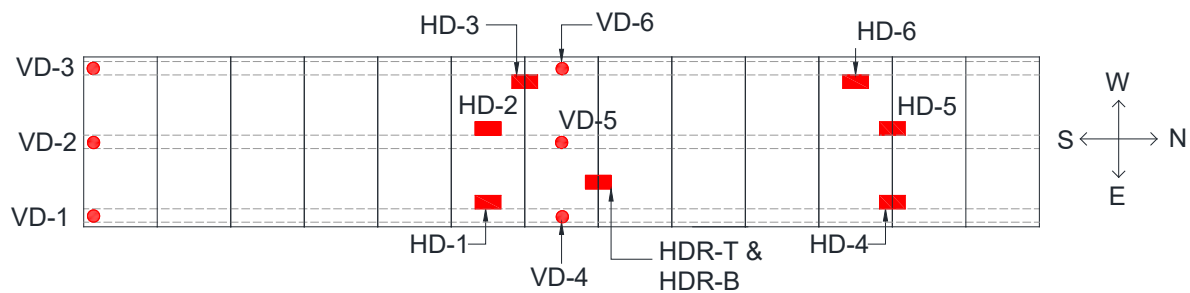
LVDT Installation Plan for Fatigue Testing of Glulam Timber Girder Bridge
